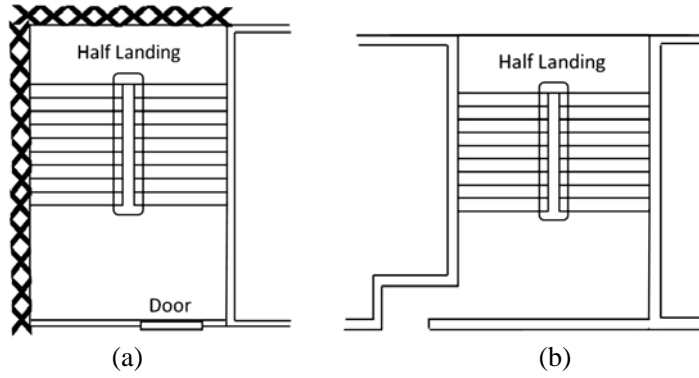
(a) layout of site 5 and (b) layout of site 6.
